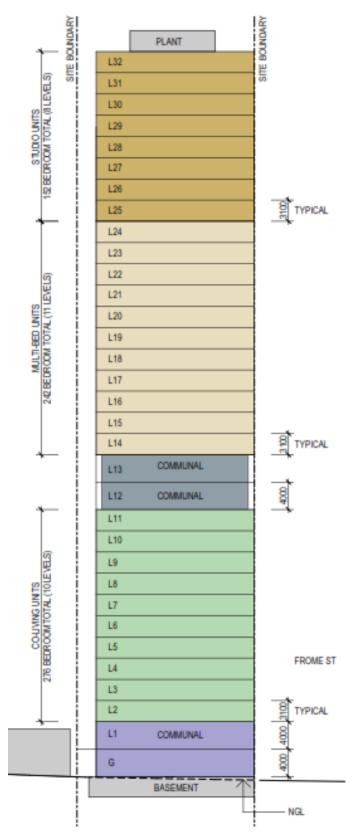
Typical section through the building (extracted from Rothelowman's drawings)
